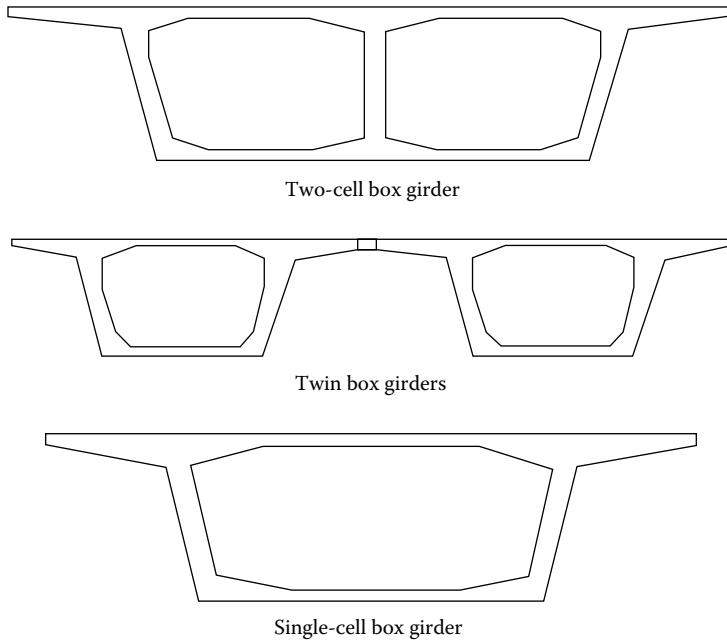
Typical cross sections for segmental bridges. (Adapted from Libby, J.R. and Perkins, N.D., *Modern Prestressed Concrete: Design Principles and Construction Methods*, Van Nostrand Reinhold, New York, 1976.)
